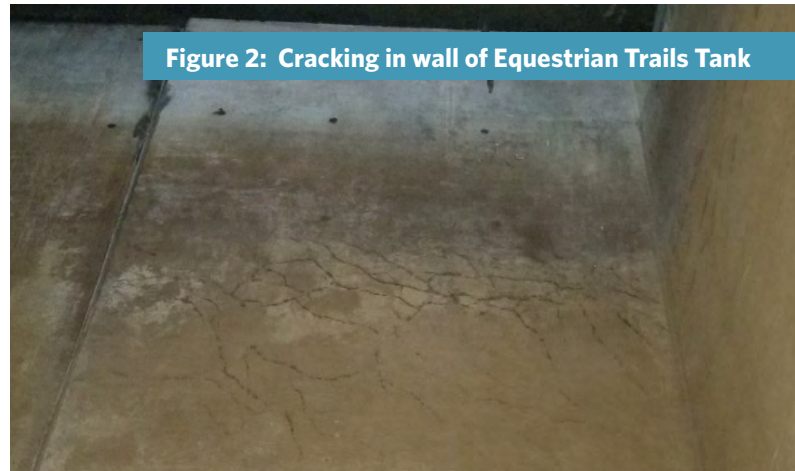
Cracking in wall of Equestrian Trails Tank
